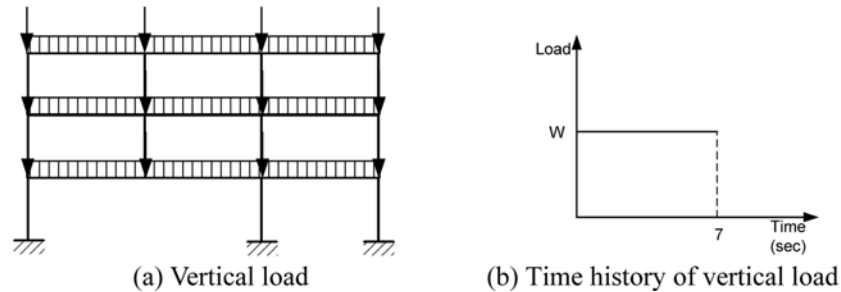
Configuration of vertical load applied on a model structure with a column lost
